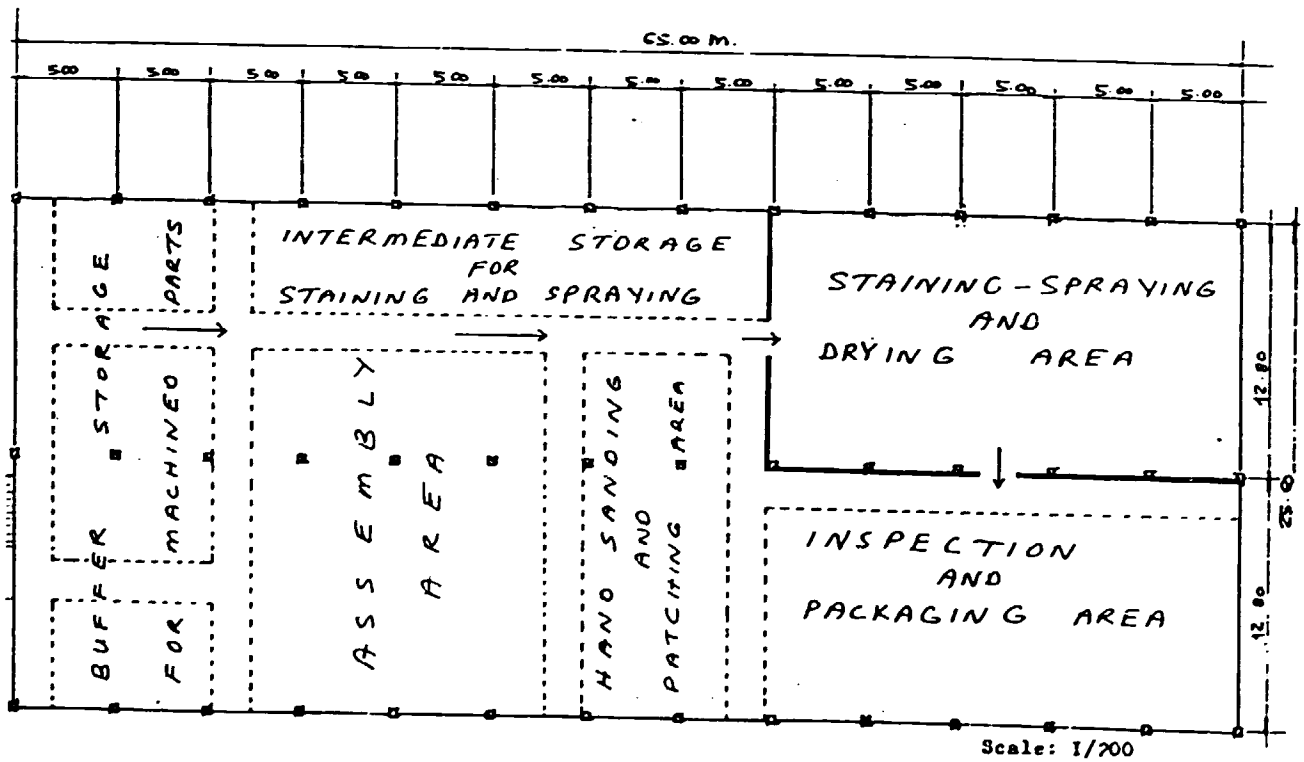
Ground Floor plan of assembly and surface finishing area of the Furniture Factory of Berben Wood.
